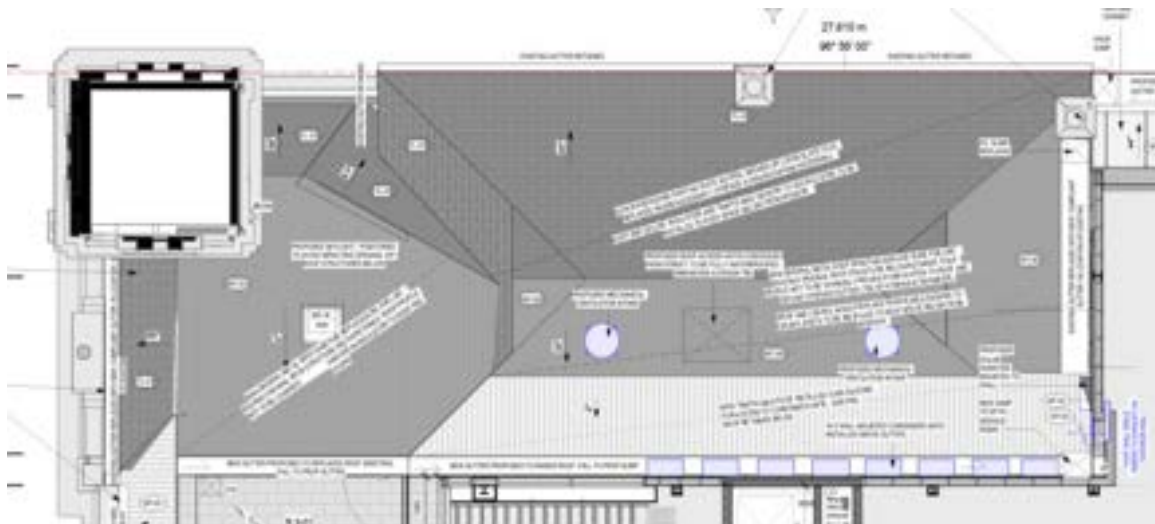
A3-105 Proposed roof plan for the Victorian building's southern metal roof. Source: Trethowan Architecture, 2025.
